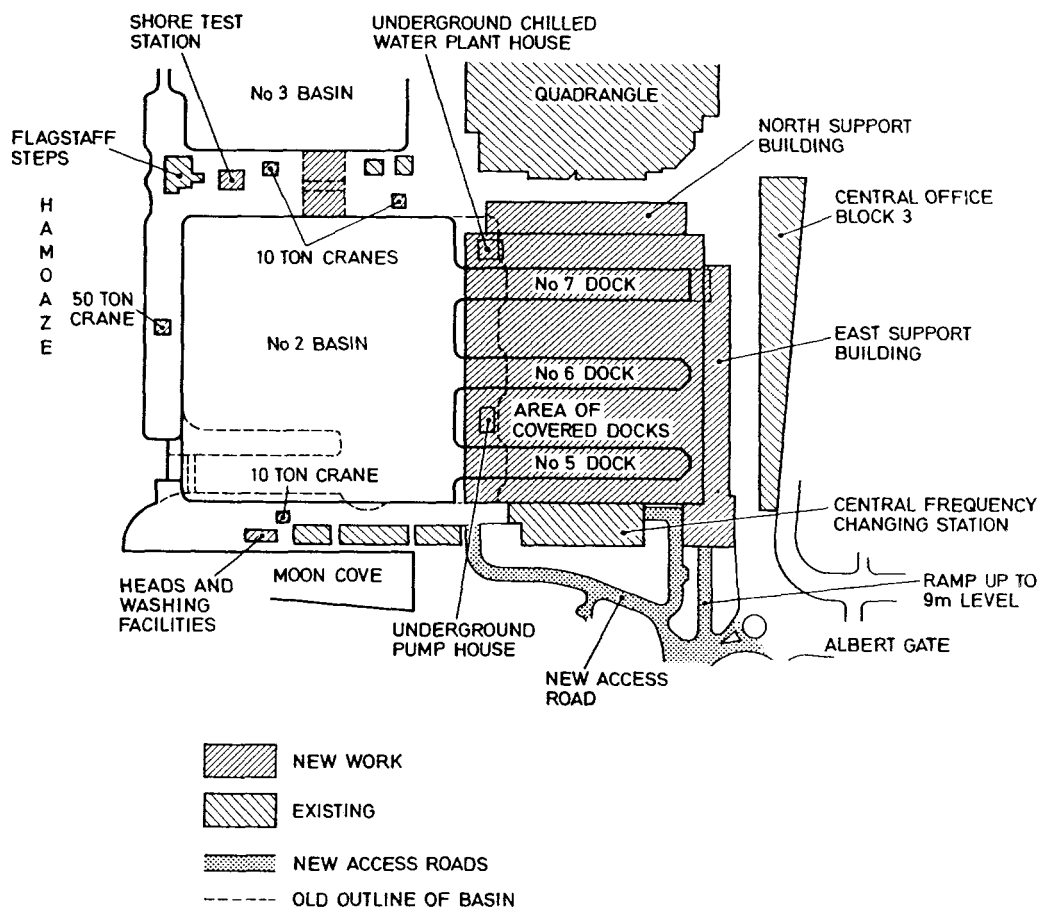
SITE PLAN SHOWING NEW WORK AND ORIGINAL OUTLINE OF BASIN AND DOCKS
